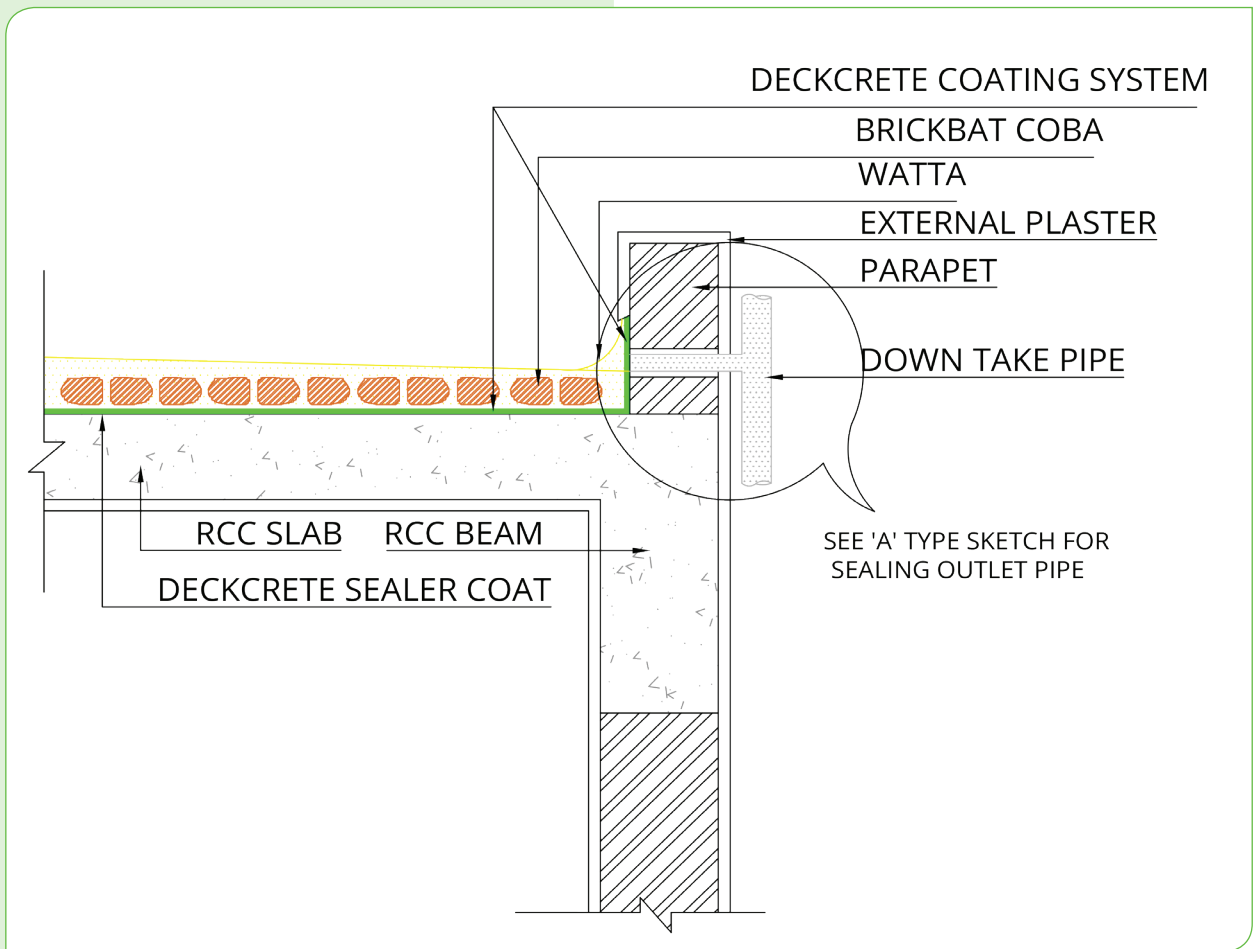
DRAIN OUTLET DETAILS THROUGH PARAPET UPSTAND
